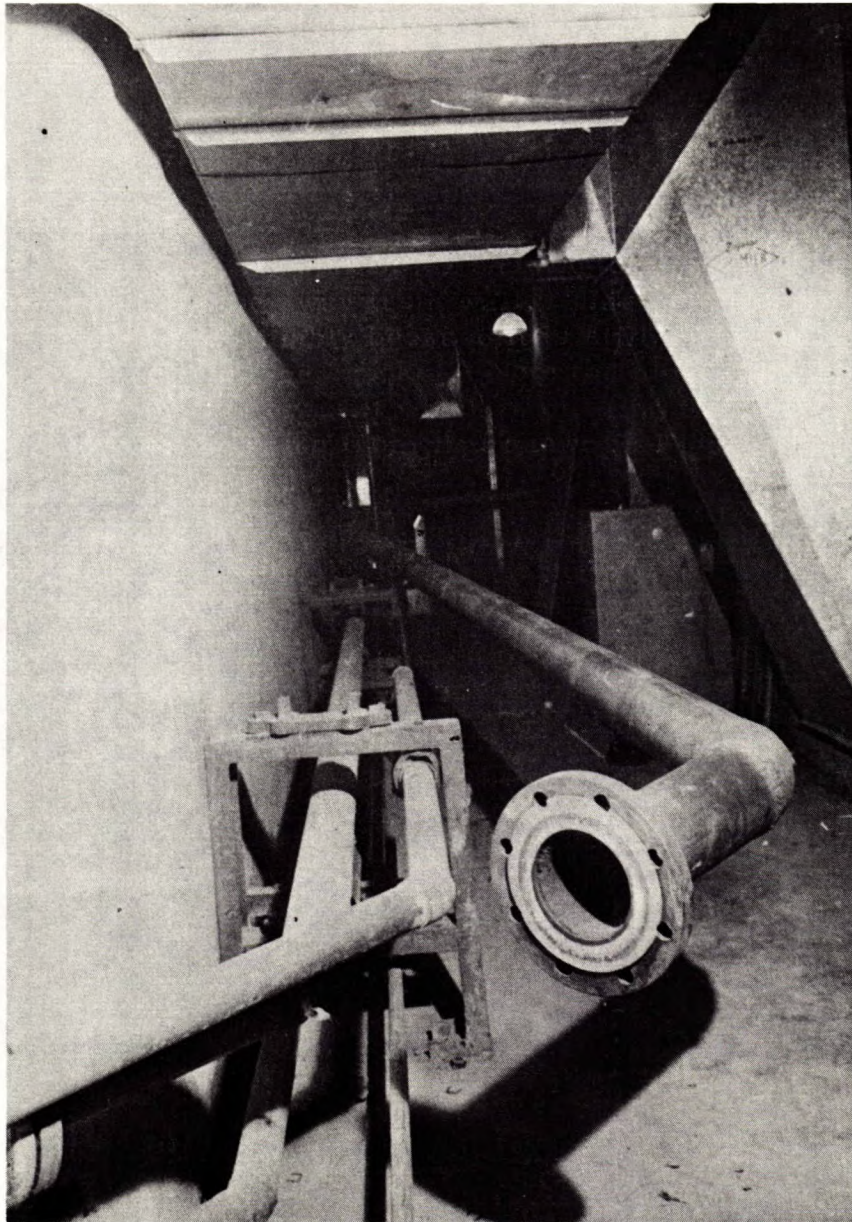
Other end of Joint No. 2 showing outward displacement of pipe away from wall. This pipe has not fallen presumably because it is still supported by the second pipe bracket. Note the pipe roller support on this bracket which is missing from the front bracket and also from that shown in Figure 15. (See Figure 13).
